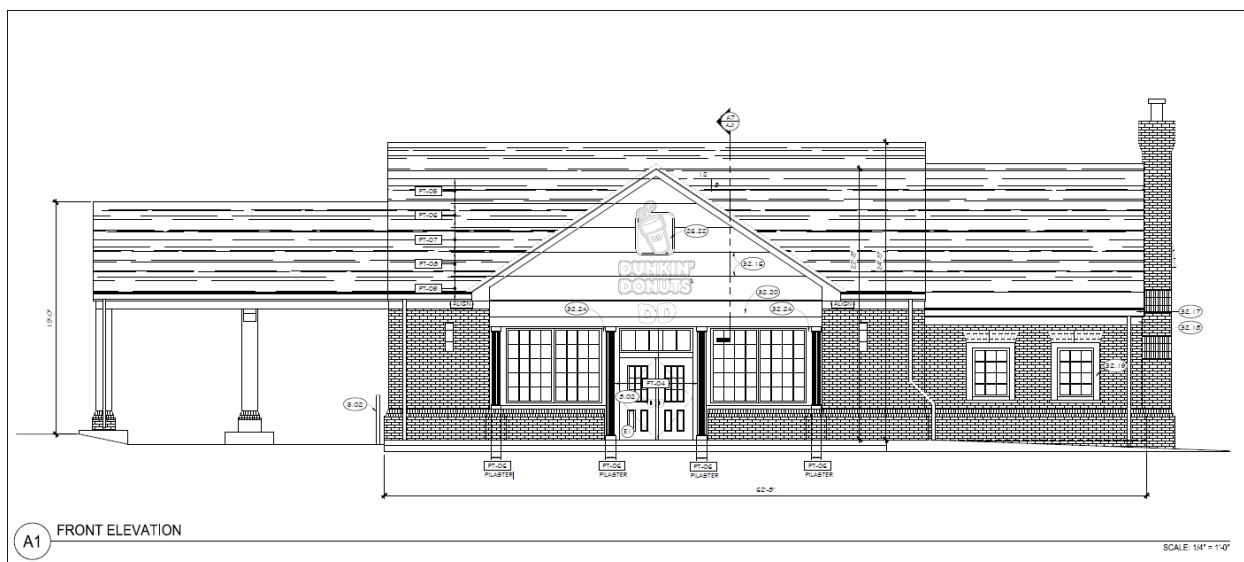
Architectural Elevation, Source: SE Plat, Sheet A-6
